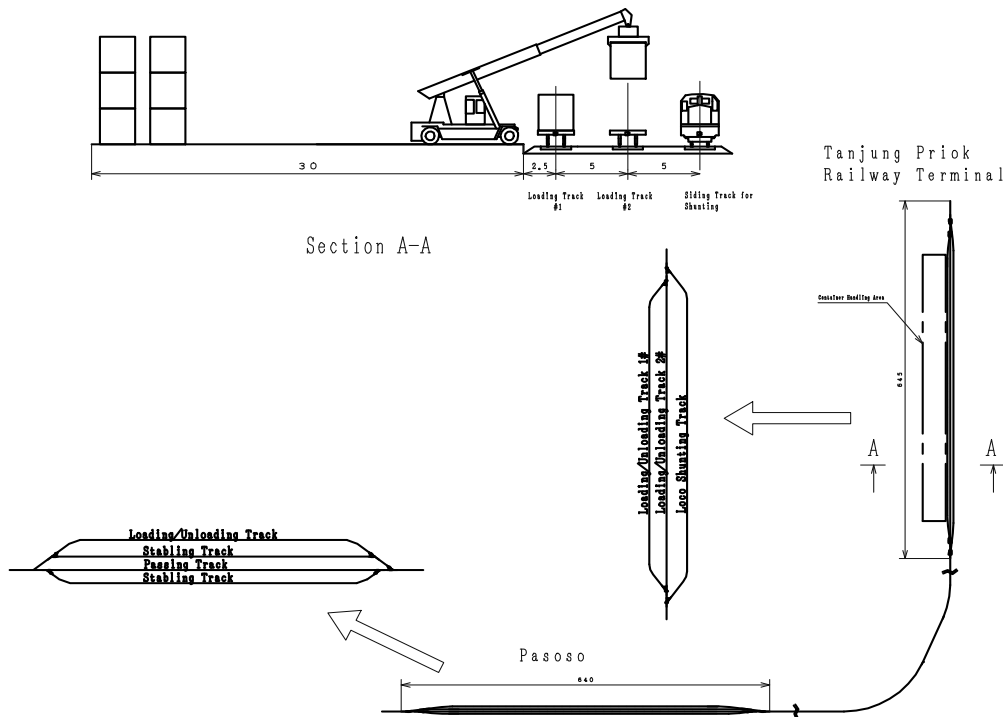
Proposed Loading Track of Tanjung Priok and Stabling Track of Pasoso
